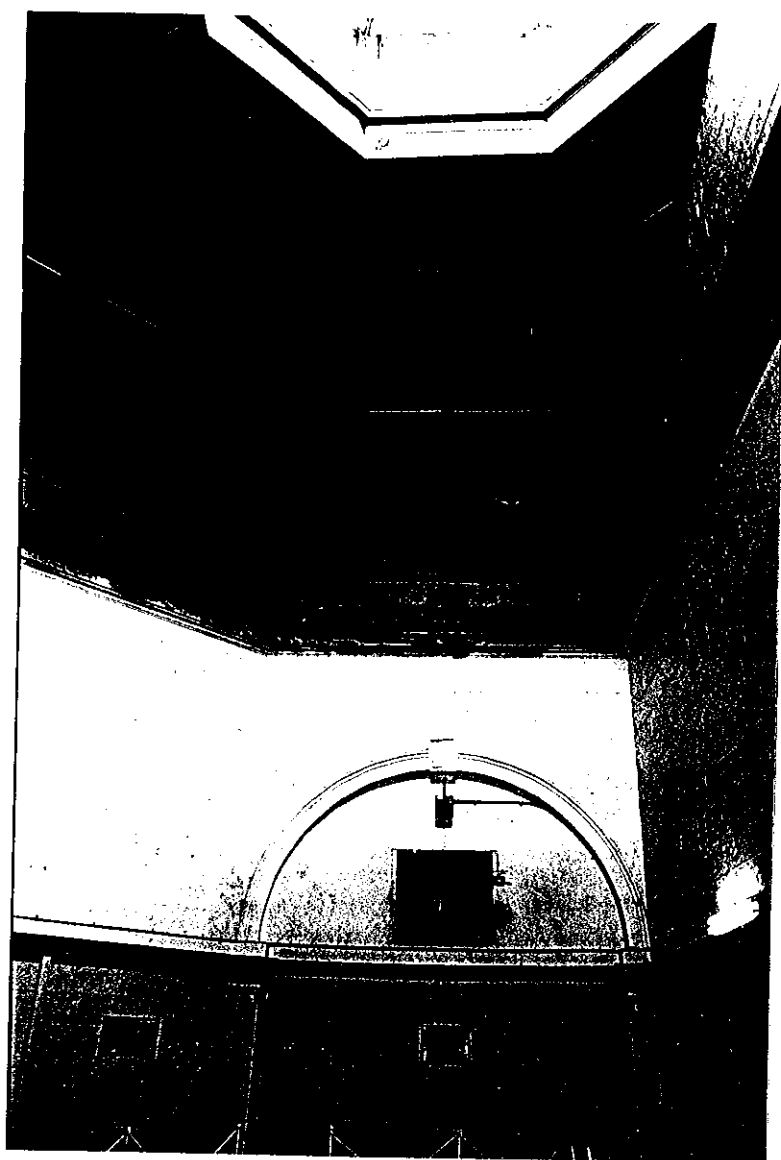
Central hall, showing the built-up arched opening to the west wing, the boarded ceiling and the octagonal lantern
